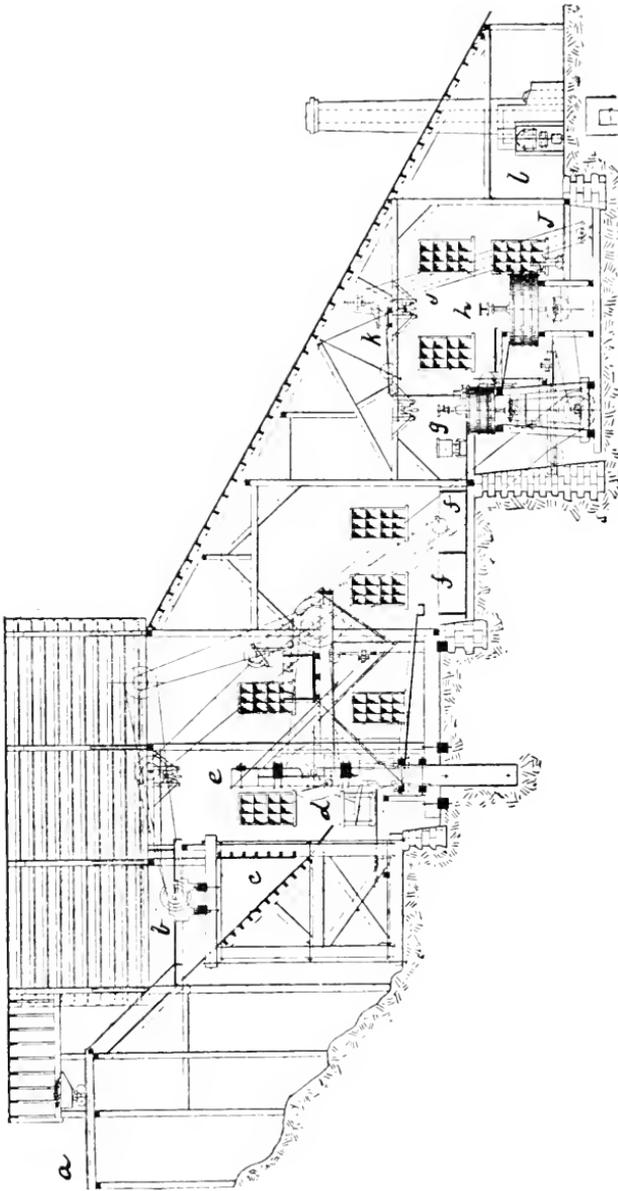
SECTION OF A WET CRUSHING SILVER MILL.
